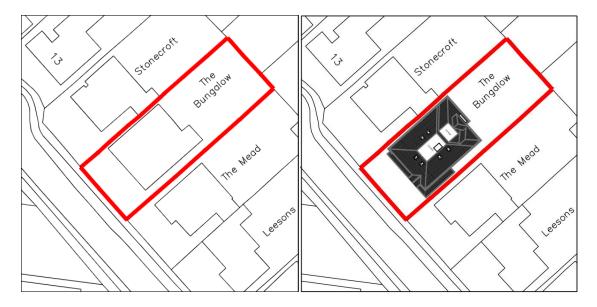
& 5 – Existing (left) and Proposed (right) block plan
